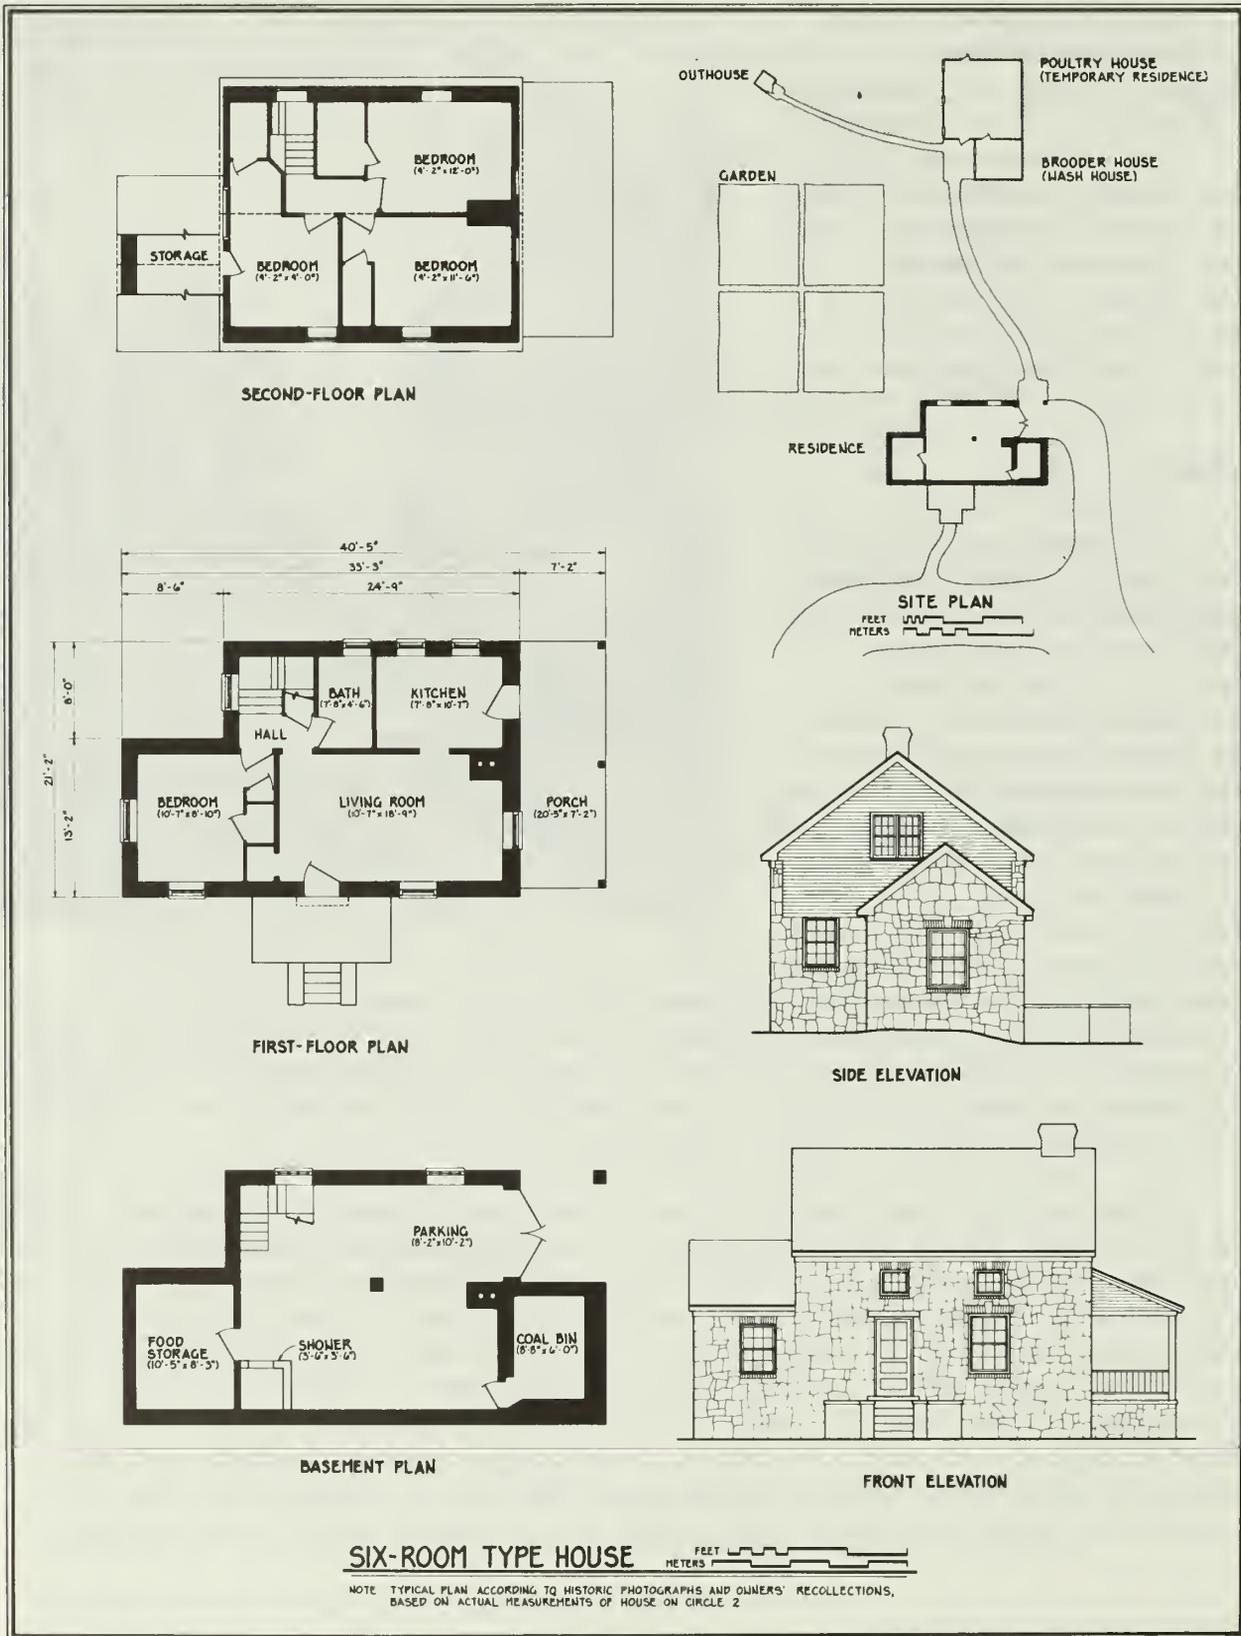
Plans, elevations, and site plan of six-room, L-plan house. Delineator: Isabel C. Yang, HABS.
